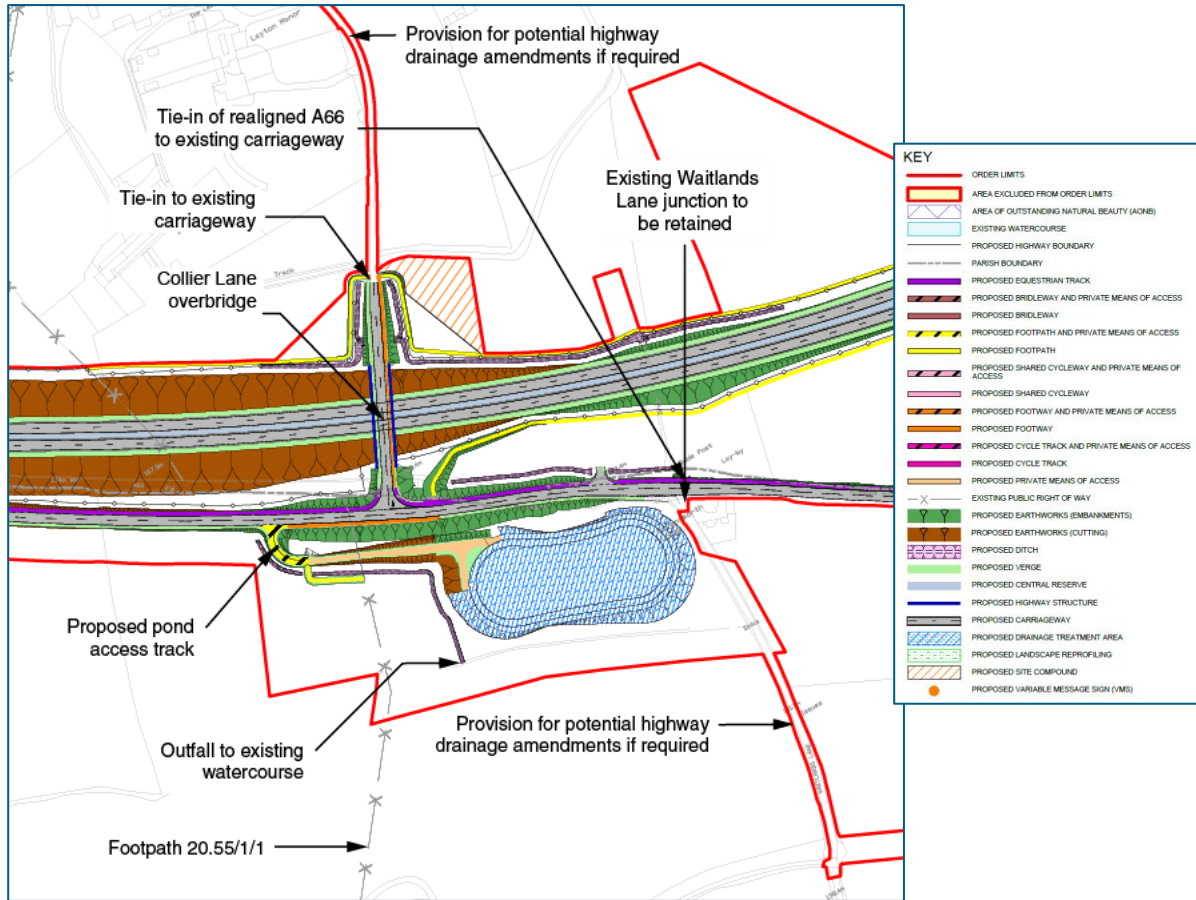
(a) Extract from General Arrangement Plans (Before)
